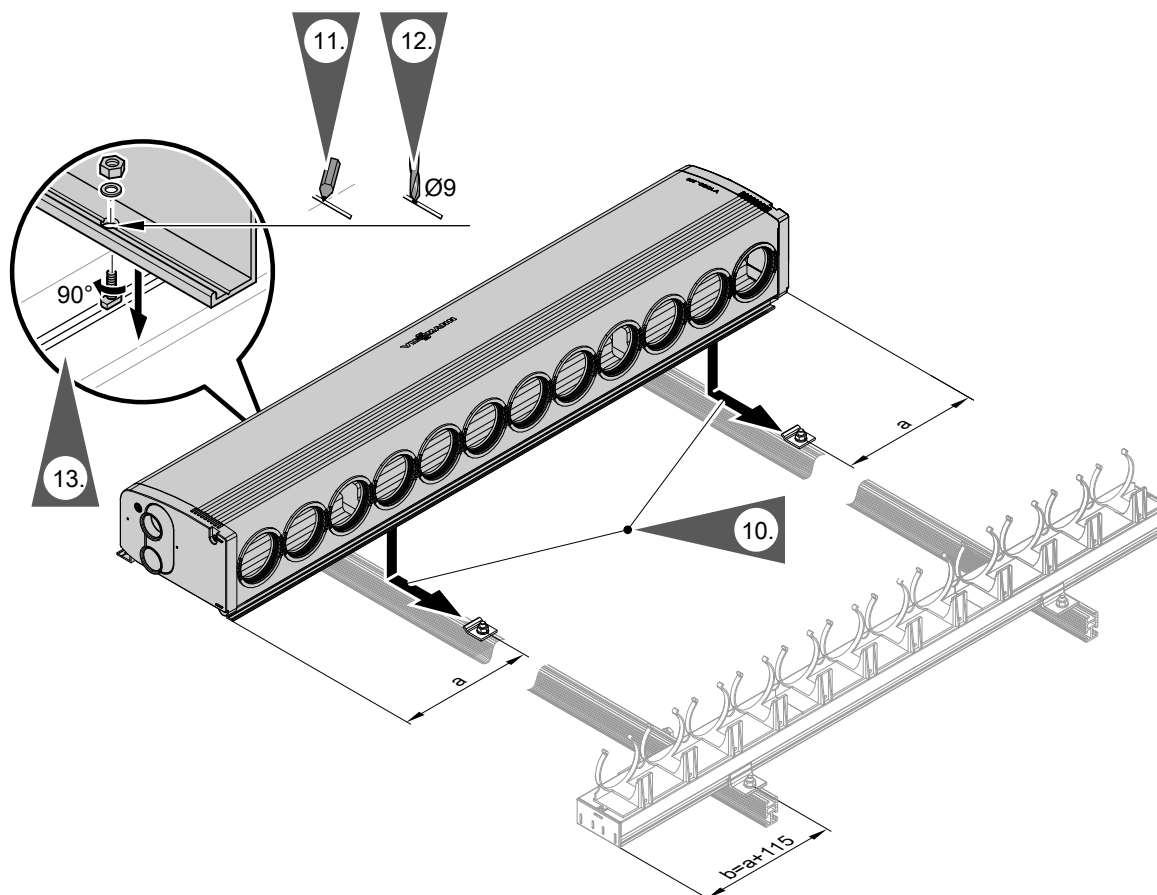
Dimension a results once the header casing is placed on the mounting rails
